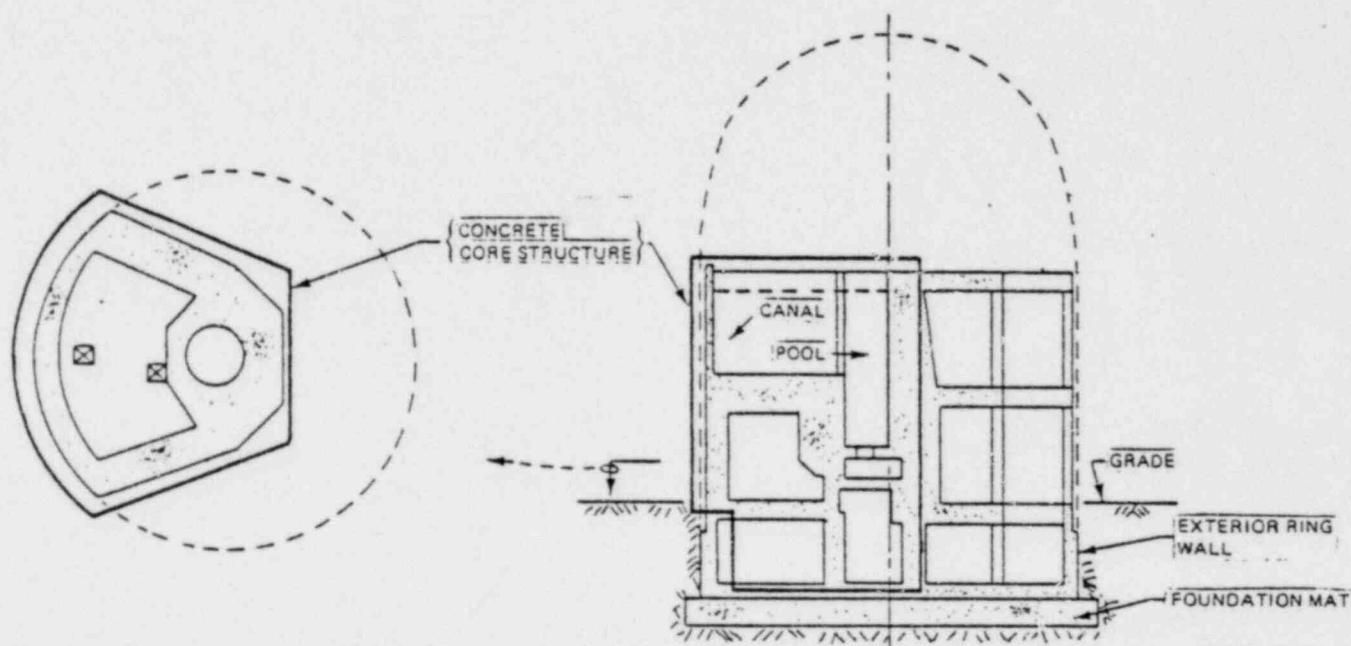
REACTOR BUILDING CONCRETE CORE STRUCTURE
